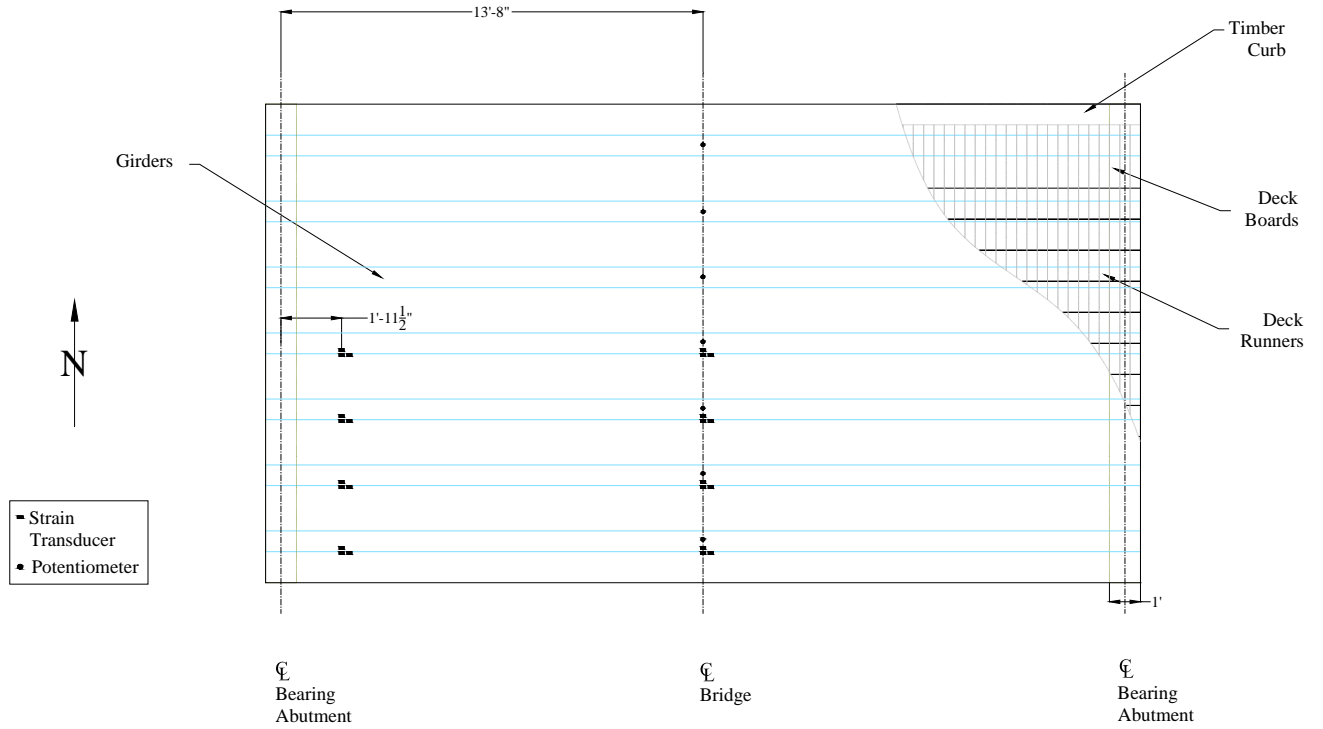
Instrumentation and Load Paths of Burnt Fork Bridge
